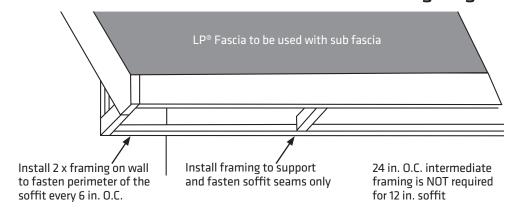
16 in. and 24 in. Cut to Width Soffit Framing Diagram
